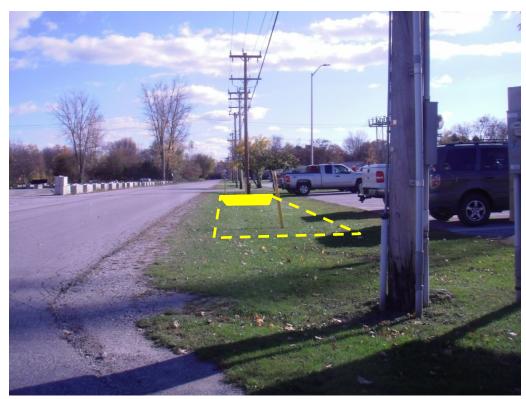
The existing shallow swale could easily be modified to enhance infiltration of stormwater runoff.
